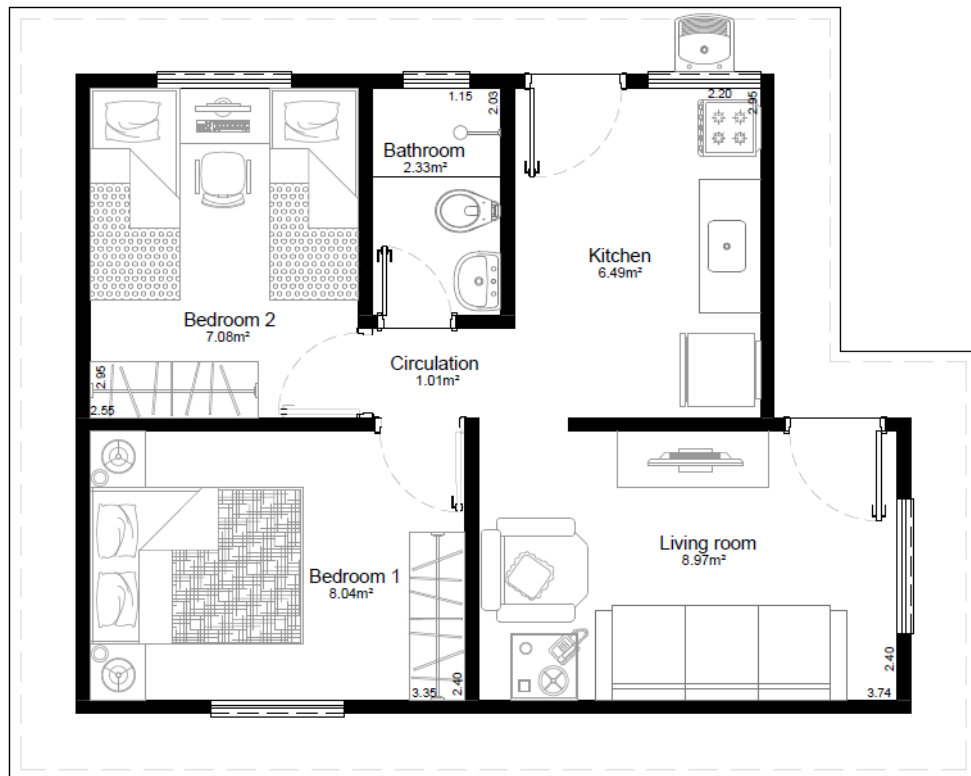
Floor plan of a standard house of Joao Alberto Amorim.
